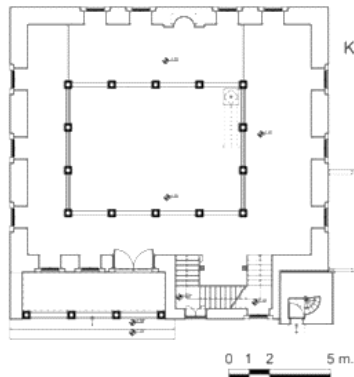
Ground floor plan Figure 5. First Floor Plan
